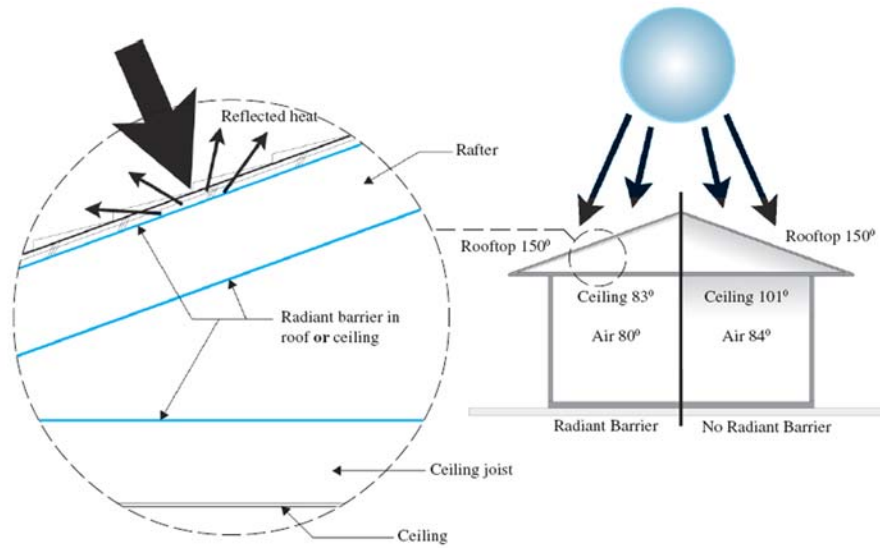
Building section showing radiant barrier construction and advantages
